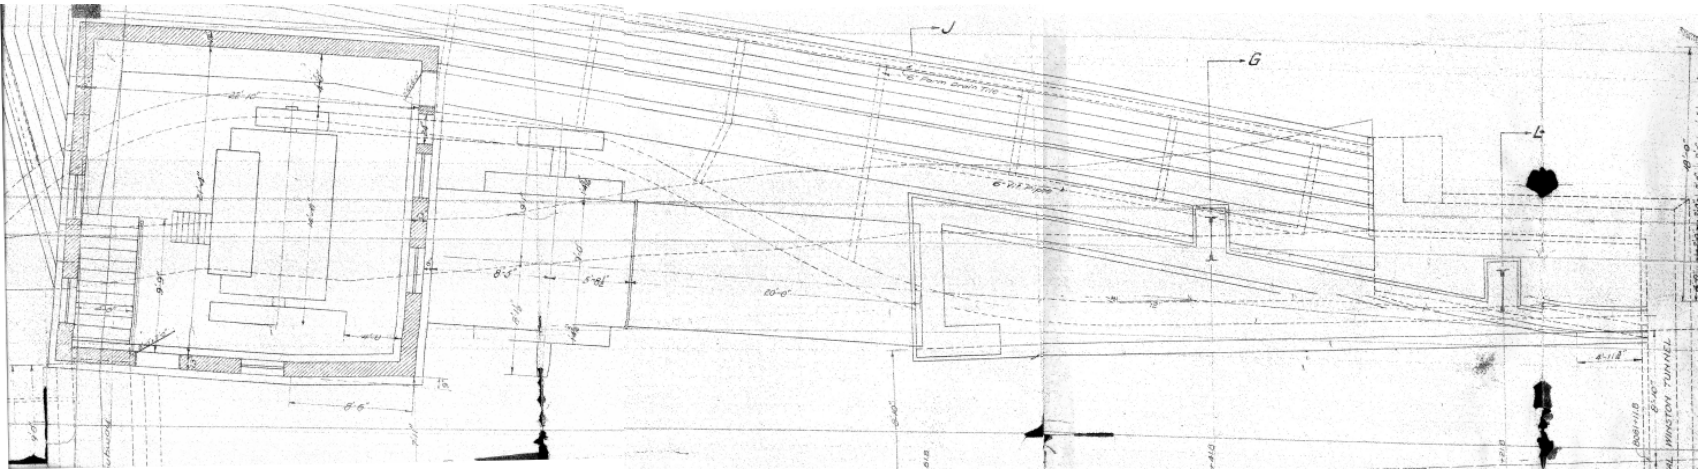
Plans for the ventilation station at the Winston Tunnel, showing the northern half of the facility originally proposed. Moving from left to right, the plans show the engine house, fan, and nozzle or cowling. The west portal to the tunnel appears on the far right. The ventilation station eventually built would be similar to this but with important differences, particularly in respect to the engine house (Chicago Great Western 1912).
